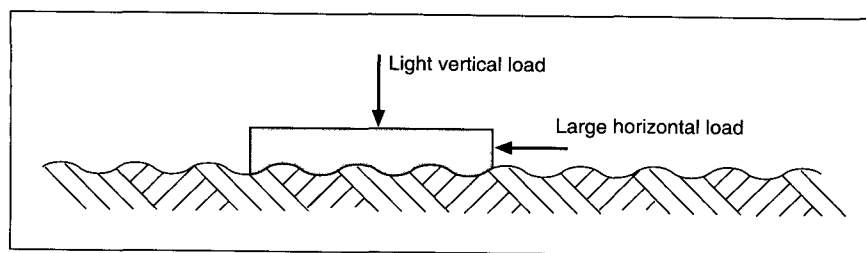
Cast in situ footing subject to rapid transient horizontal load
